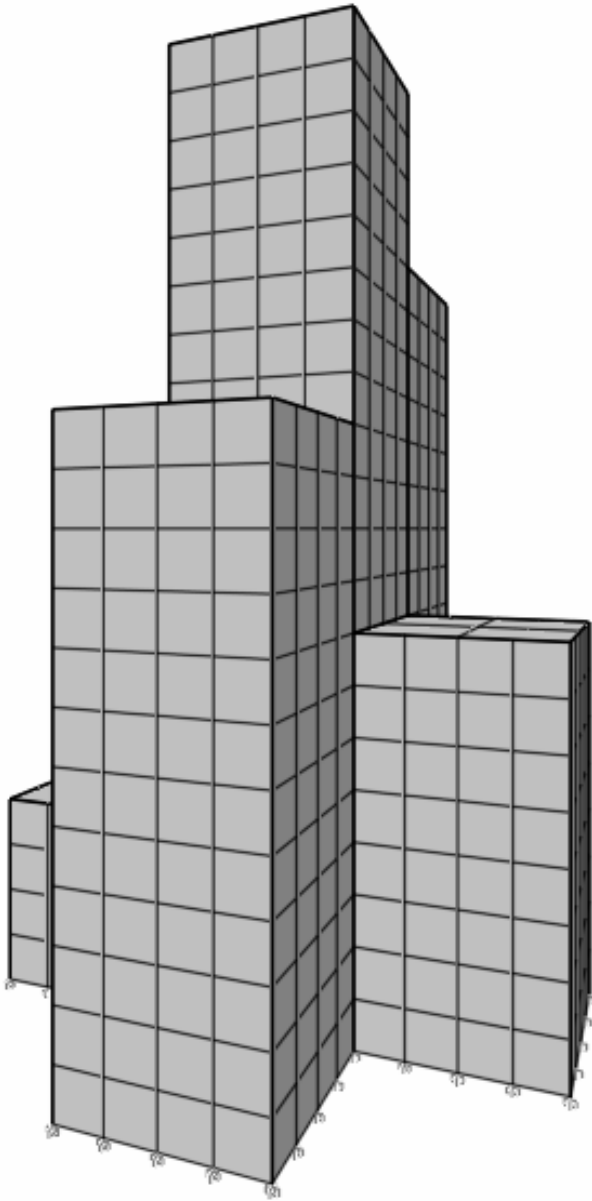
3-D view of twenty-story, 1860 member steel space frame
